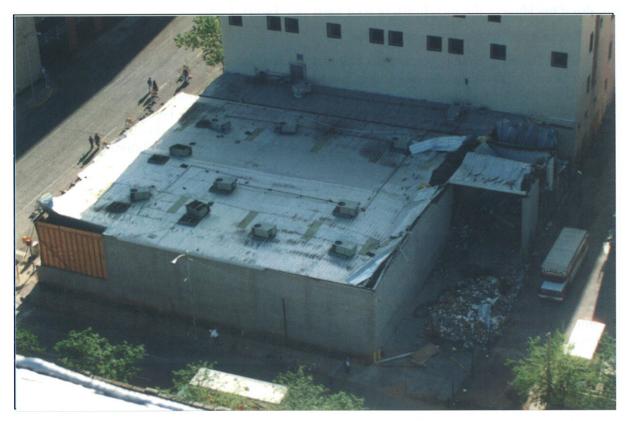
Damage to roof and walls of one-story light-metal steel building (Journal Record Annex) on west side of main Journal Record building.
